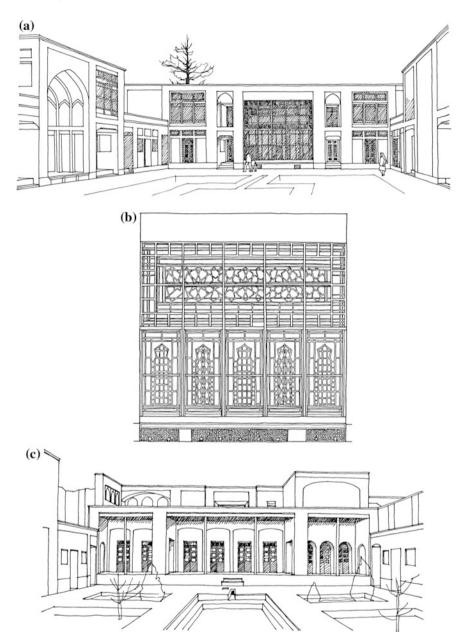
Nain. The inner part of Fatemi house, pictures showing the arrangement of all elements into a unified whole: a Summer area façade. b Detail of central room sash window. c Winter area facade
